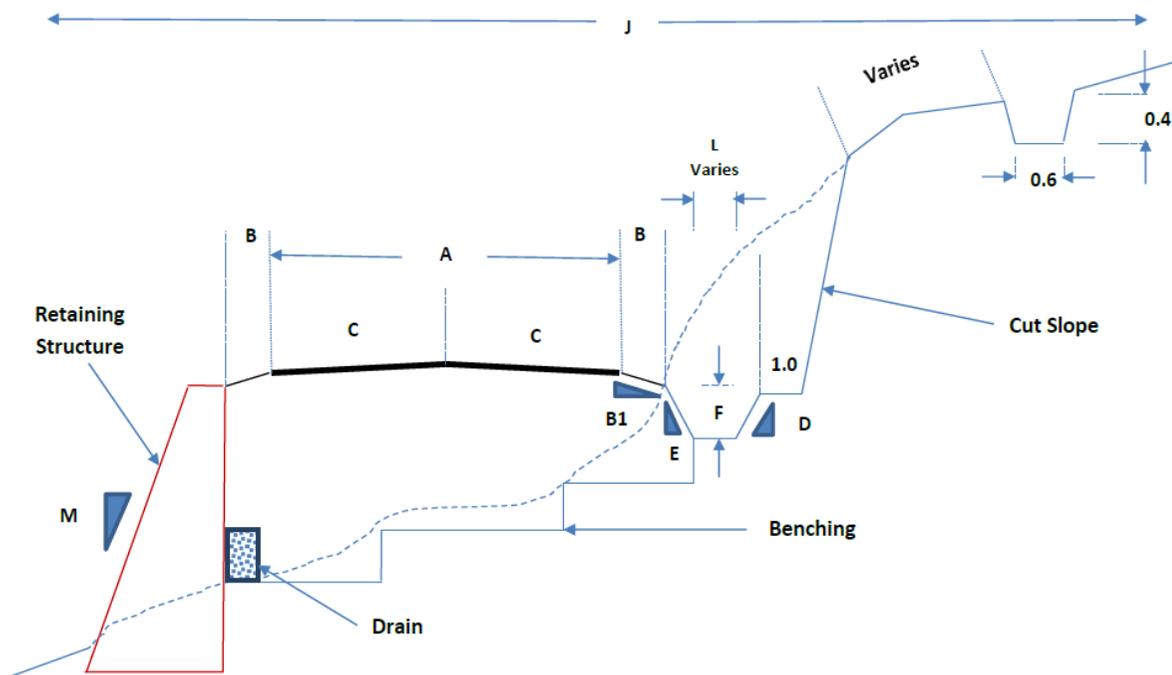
Typical cross section: DC1 – 4, Escarpment Terrain, Unpaved
